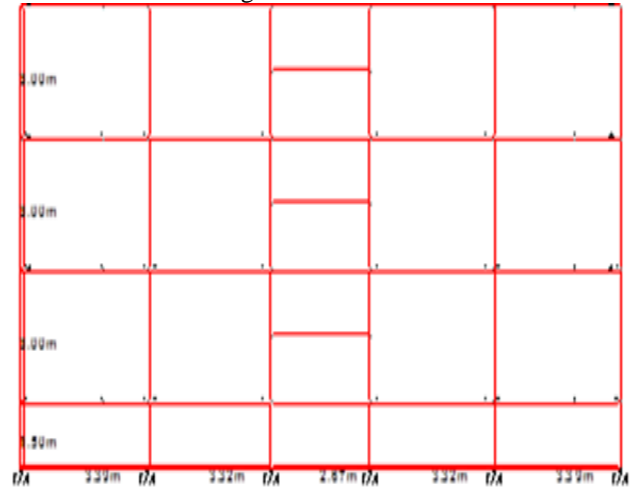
RC Frame Structure with Sill level Bands. Case 4
